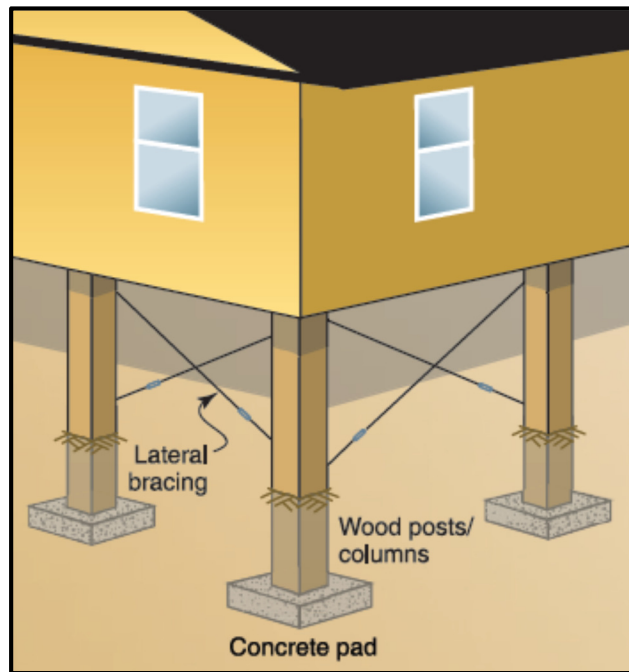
Post/Column Foundation (source: FEMA Homeowner's Guide to Retrofitting)
